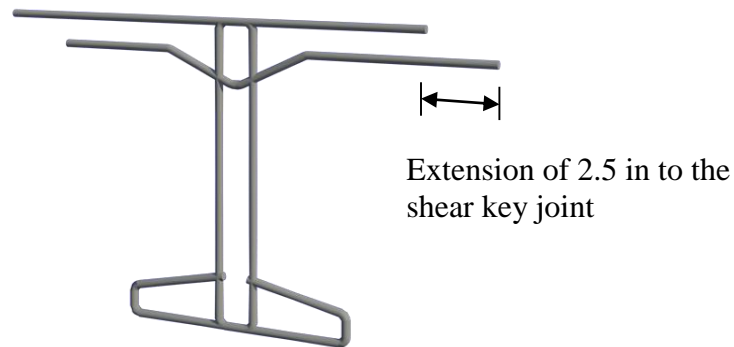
Steel stirrup for interior beams in bridge model
